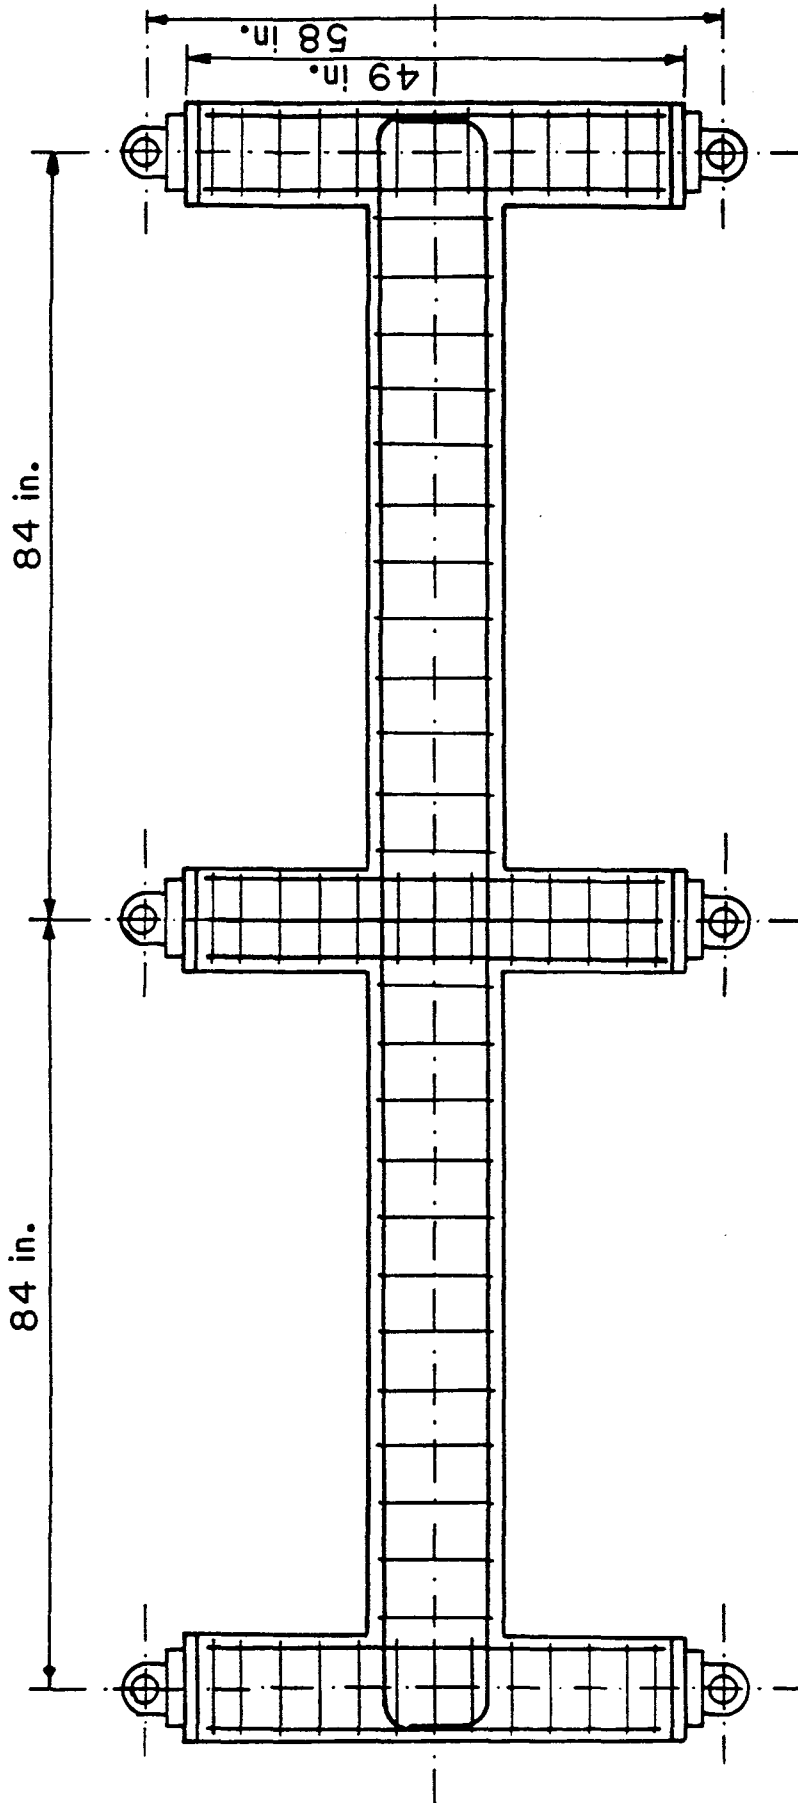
Typical Reinforcement Detail of the test Subassembly
